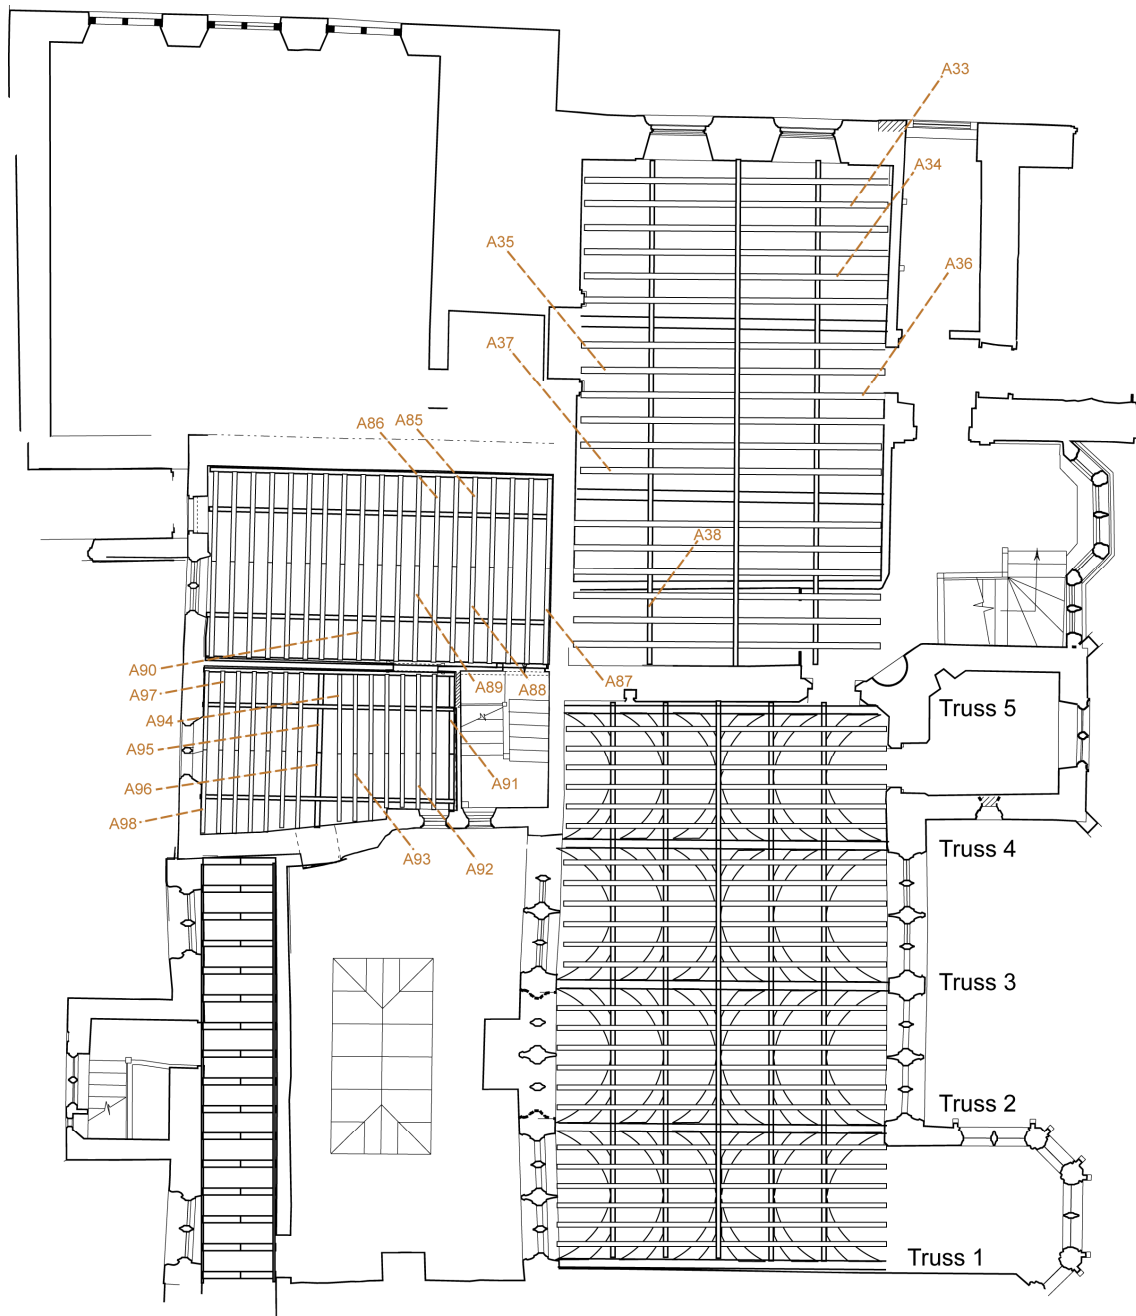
Roof timbers, first- and second-floor rooms at the northern end of the Hall range, showing the locations of samples APT-A33-8, A85-98
